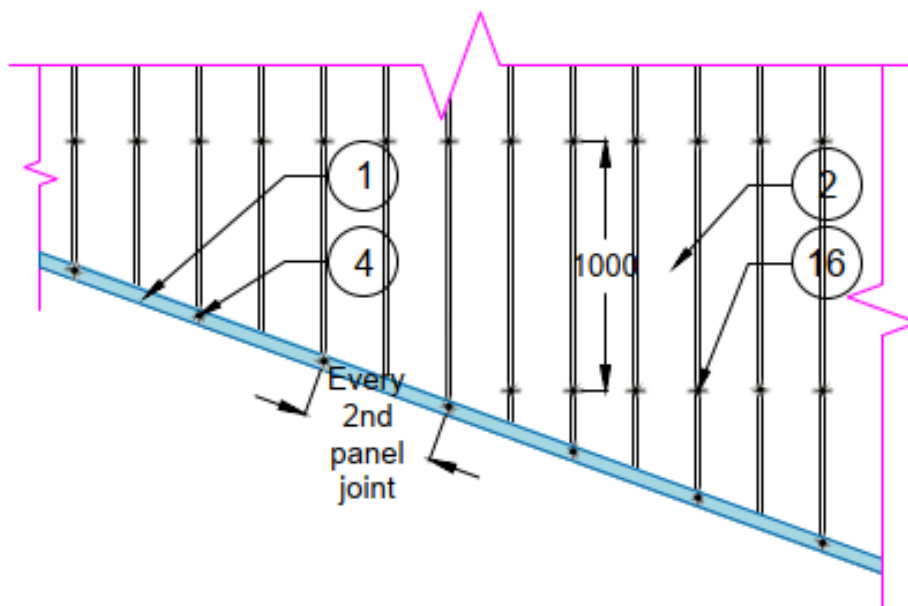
Vertical Speedpanel wall connected to stair stringer (elevation view)
